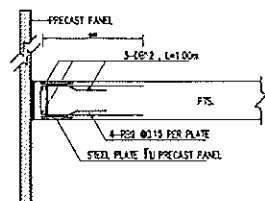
REINFORCEMENT FOR BLOCKOUT LESS THAN 400 mm.
